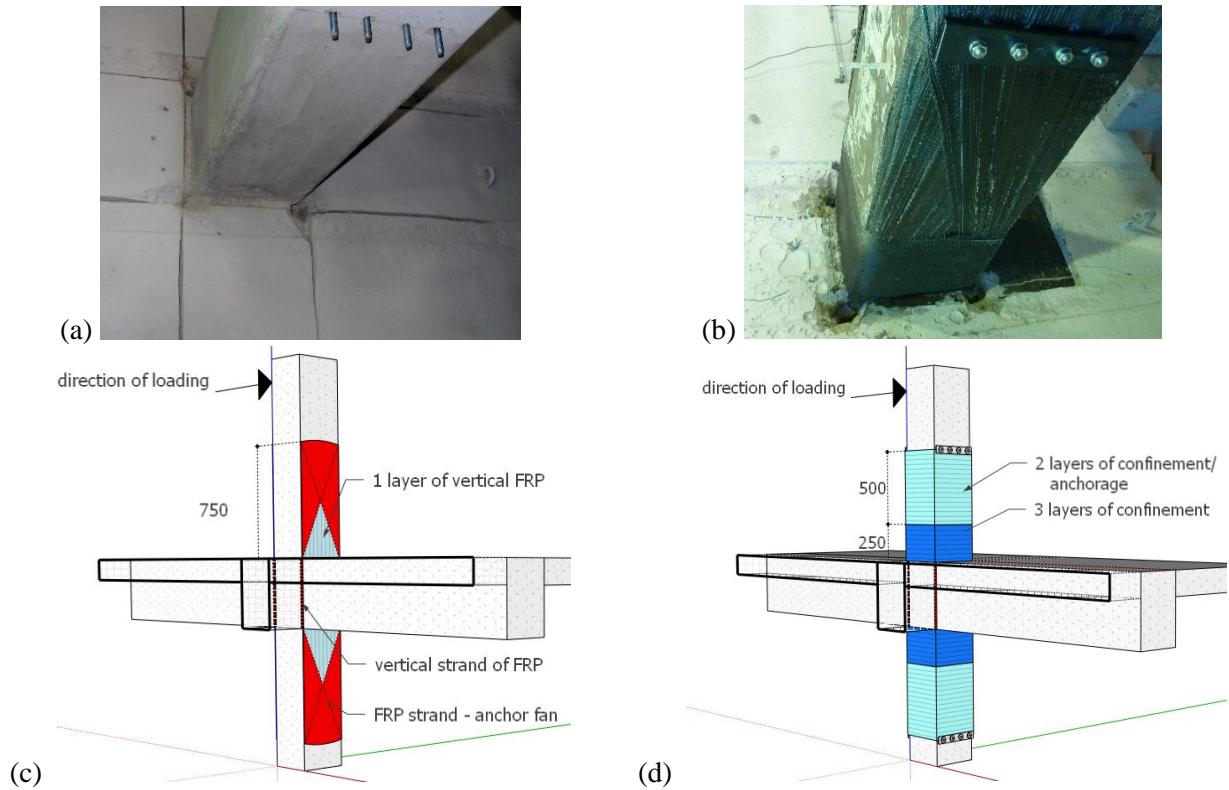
(a) Selective weakening cuts; (b) Applied retrofit FRP strands, anchors and first layer of confinement. (c) First steps of retrofit; (d) final stage of retrofit.
